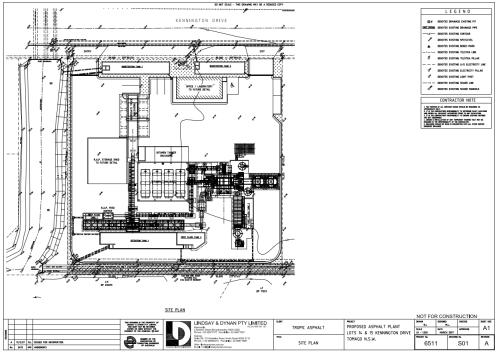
Site Plan (Source: Lindsay Dynan - Not Final Construction Plan)
